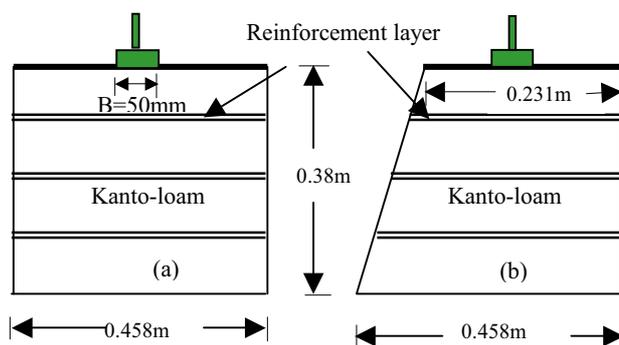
Details of model tests (a) Level ground, (b) Embankment
